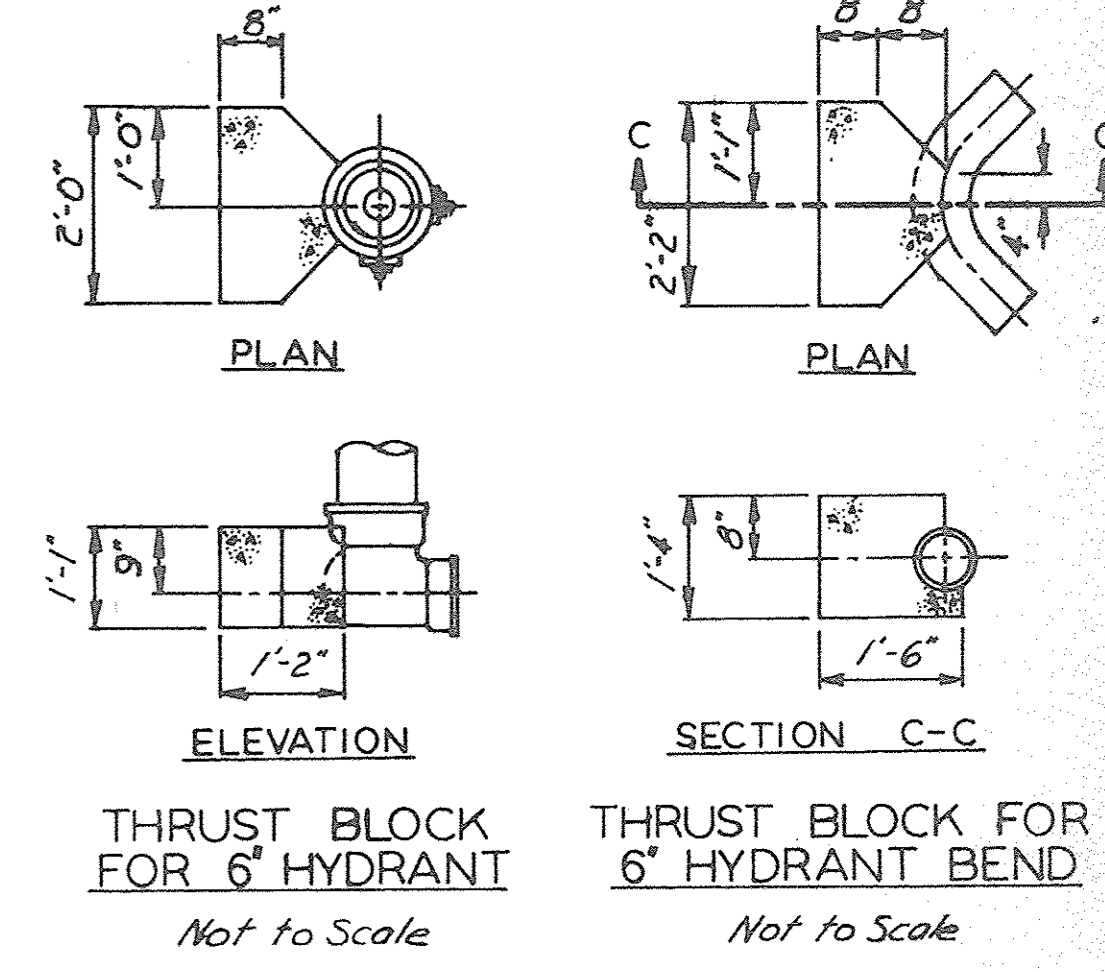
" HYDRANT INSTALLATION STRAIGHT AWAY
